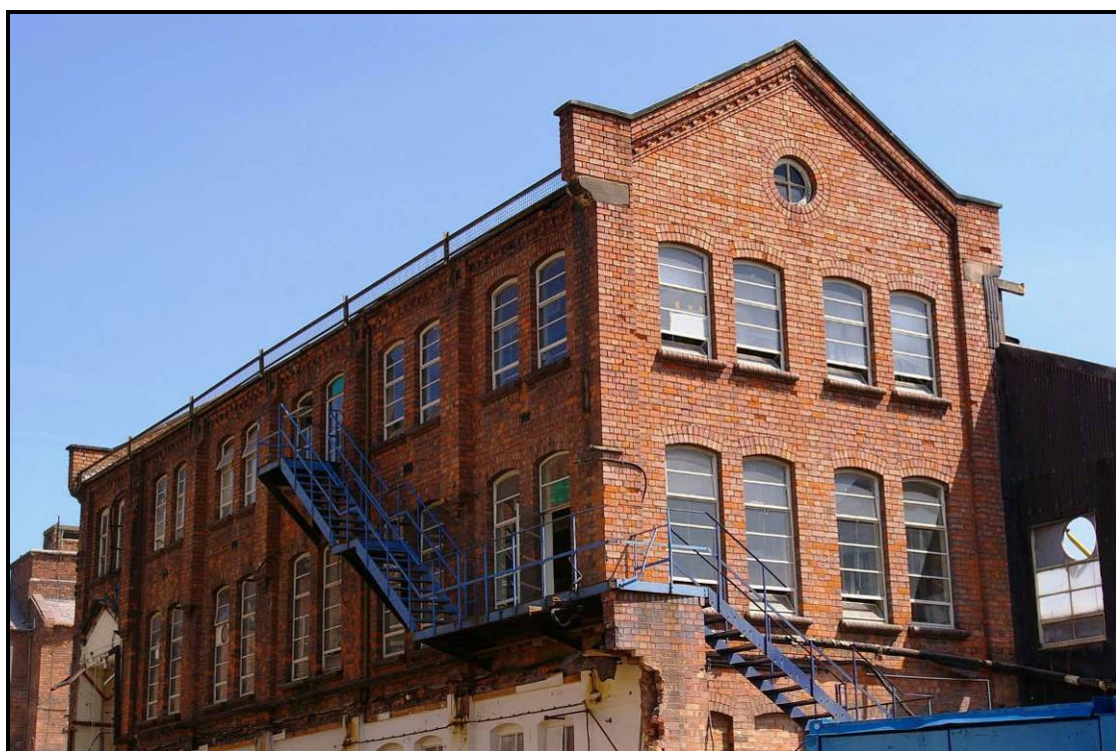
East elevation of Building R after demolition of adjacent buildings
